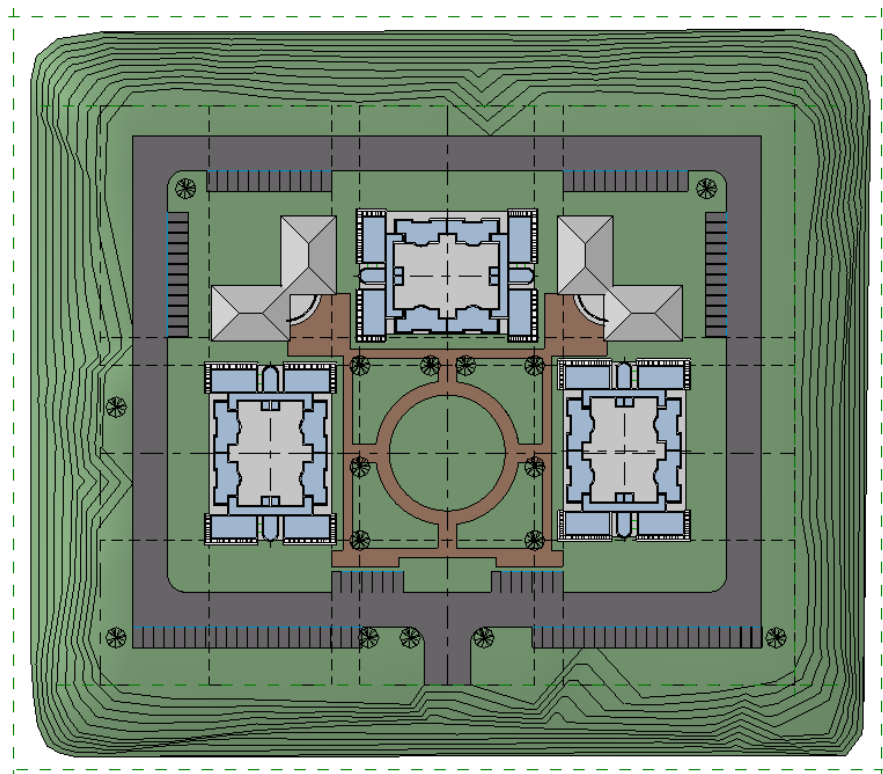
The sketch plan for linking Apartment Cluster and Club project to the Site Plan project
